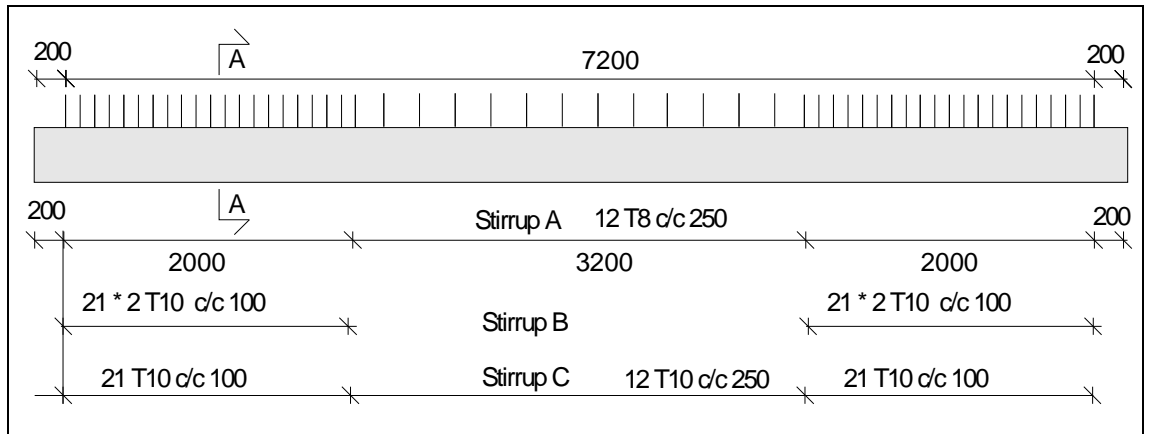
Stirrups. Txy refers to a reinforcing bar with diameter xy mm, see 9.1. Stirrup A is a hoop (rounded rectangular) surrounding all longitudinal rebars shown in Fig. 6.
